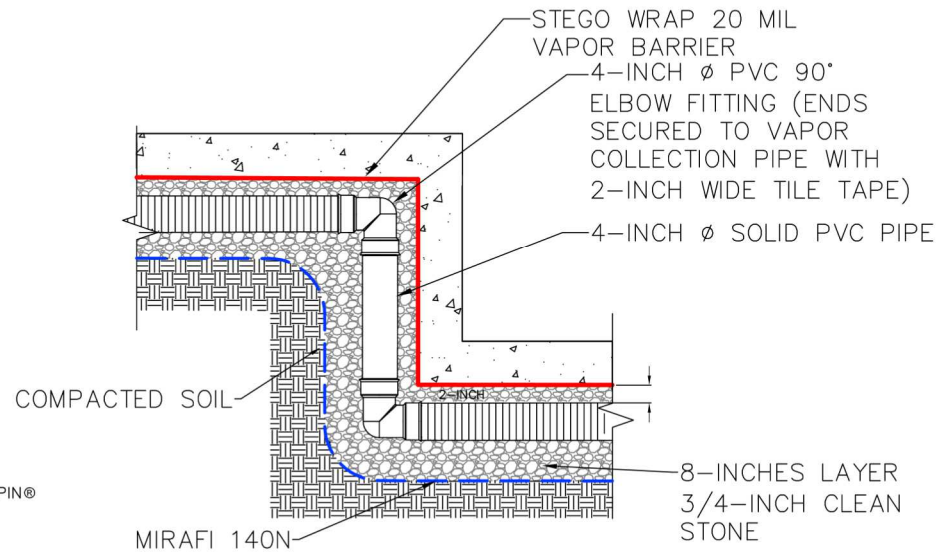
TYPICAL SECTION FOR VAPOR COLLECTION PIPE AND VAPOR BARRIER
